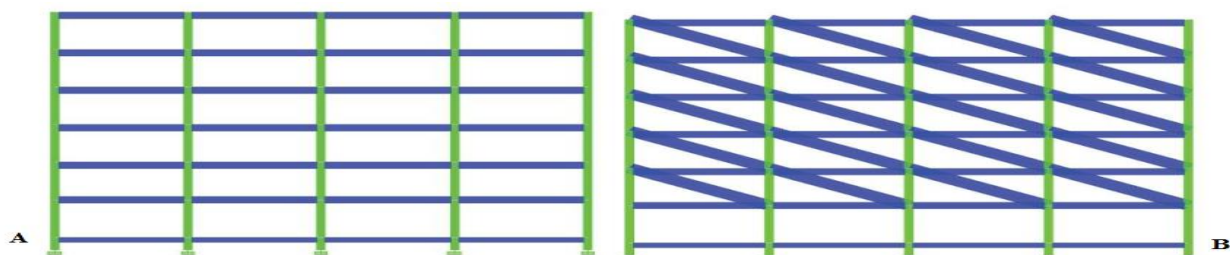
4 (A) Bare frame (B) frame with infill wall in all stories except ground floor [16]
